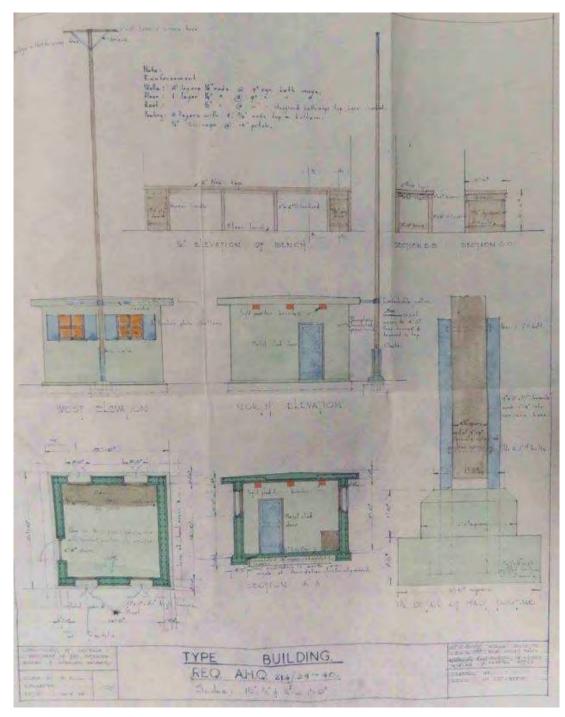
Plan of February 1941 of the concrete building to be erected at Shepherds Hill. Position on the man site is not known. (Source: NAA SP155/1, DEF25141L)
